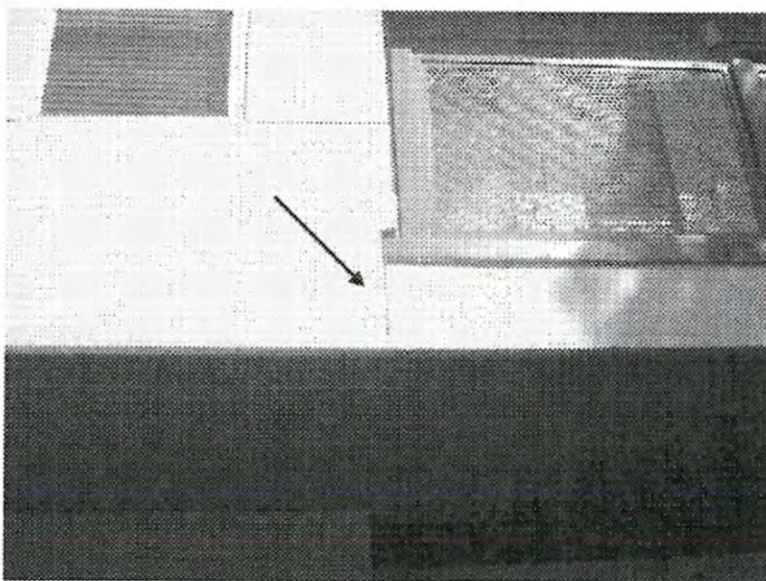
Cracking at balcony on Building D despite adjacency to control joint.
